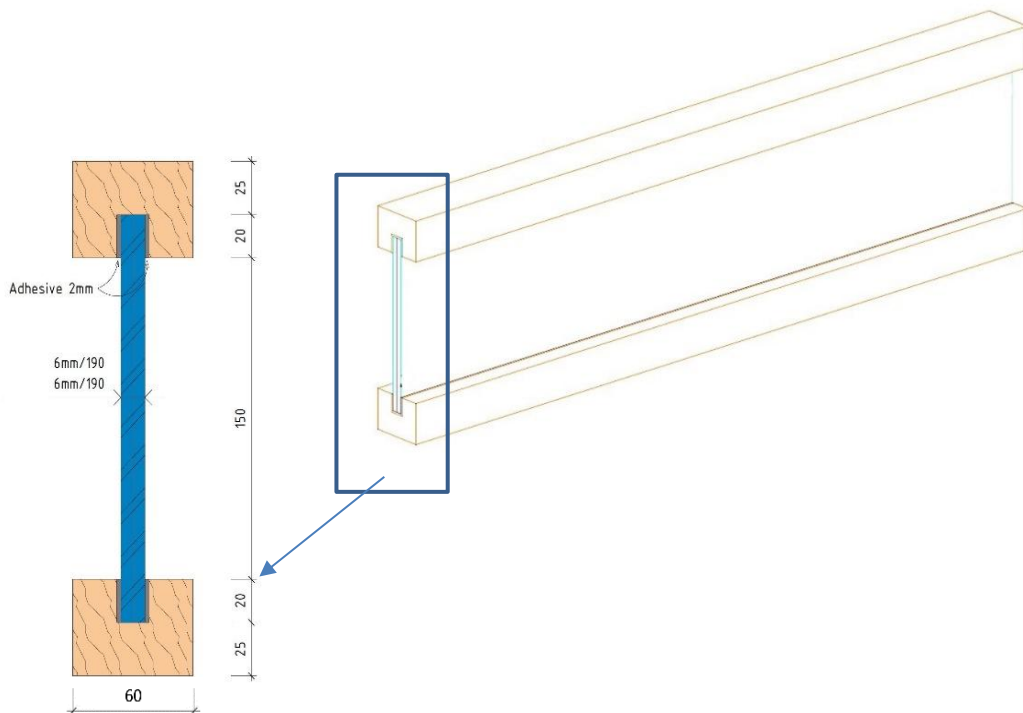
Cross-section and dimension of the timber-glass I-shaped beam.
